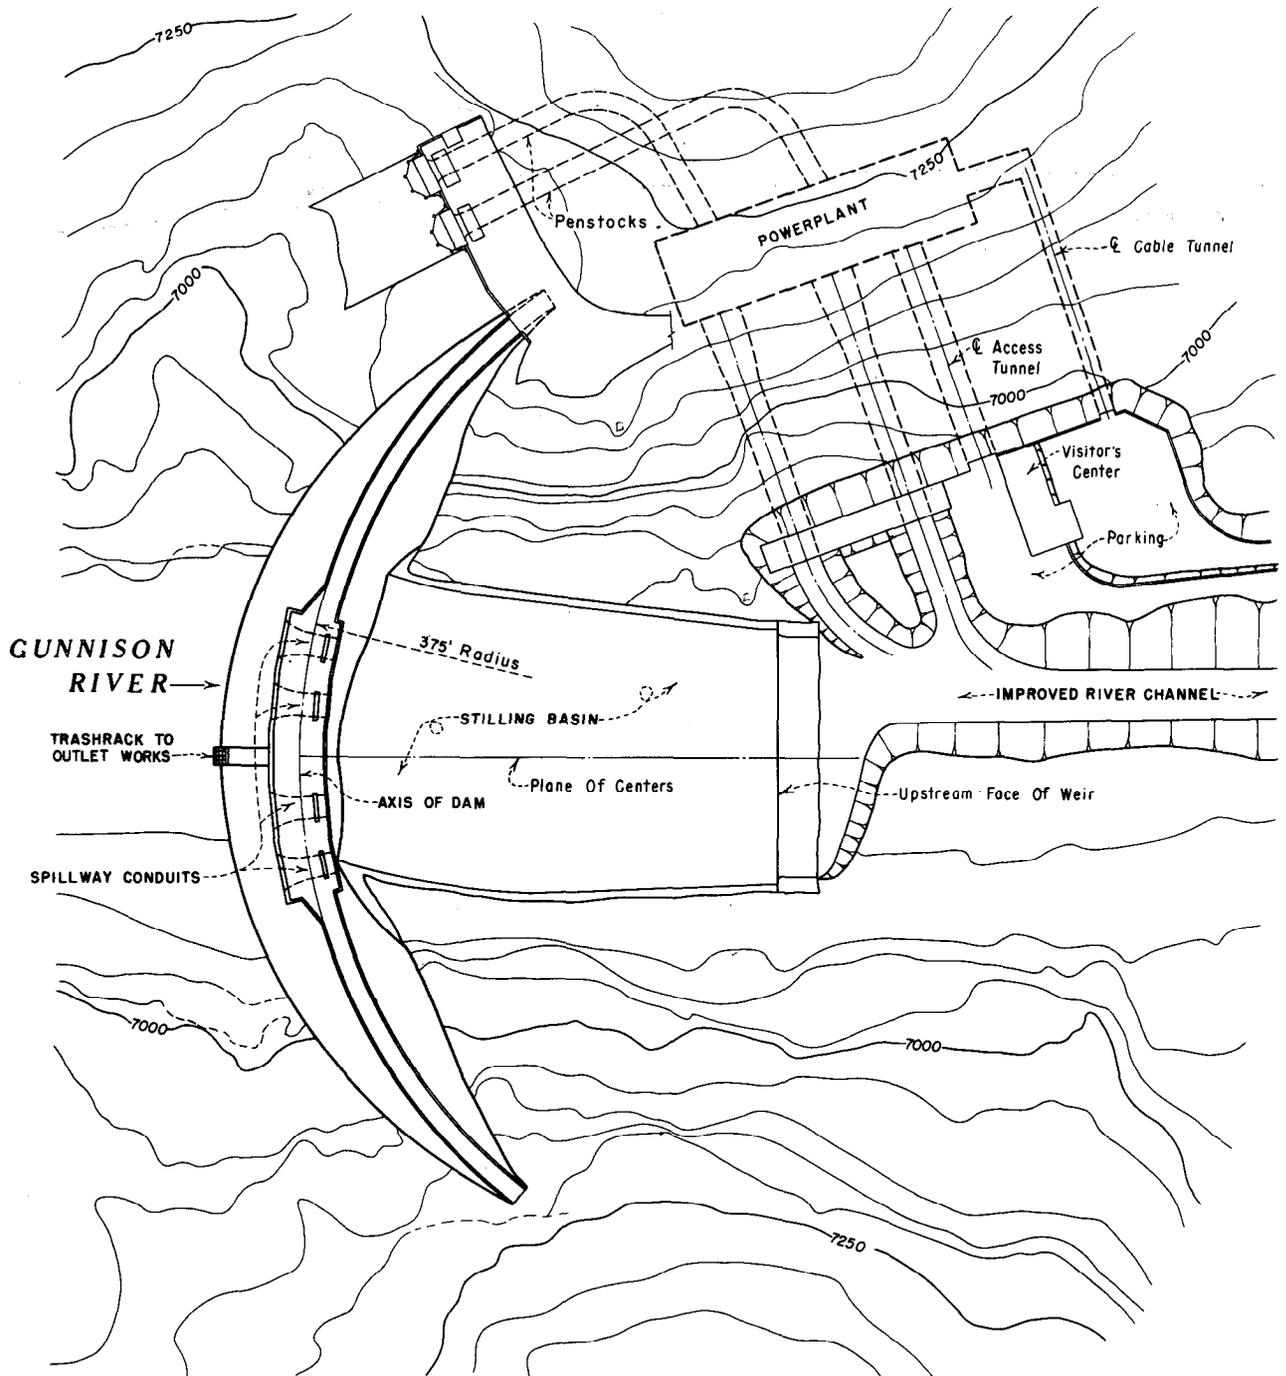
Plan of Morrow Point Dam and Powerplant.
